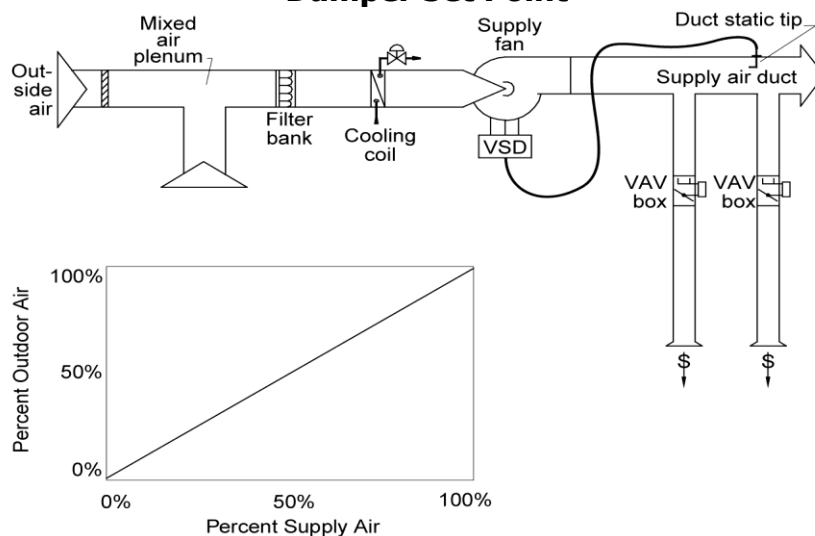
shows a typical VAV system. In standard practice, the testing and balancing contractor sets the minimum position setting for the outdoor air damper during construction. It is set under the conditions of design airflow for the system and remains in the same position throughout the full range of system operation, which does not meet code. As the system airflow drops, so will the pressure in the mixed air plenum. A fixed position on the minimum outdoor air damper will produce a varying outdoor airflow. Figure 4-5 shows this effect will be approximately linear
